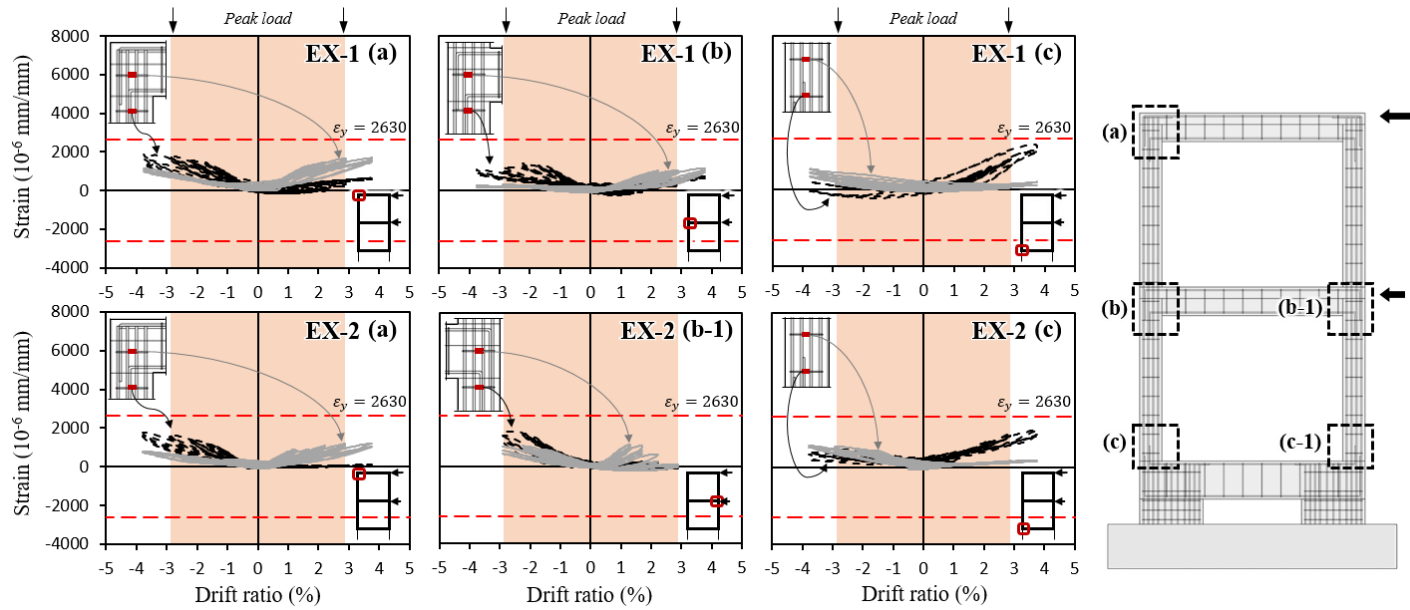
Strains of column shear reinforcement in specimen EX-1, EX-2
